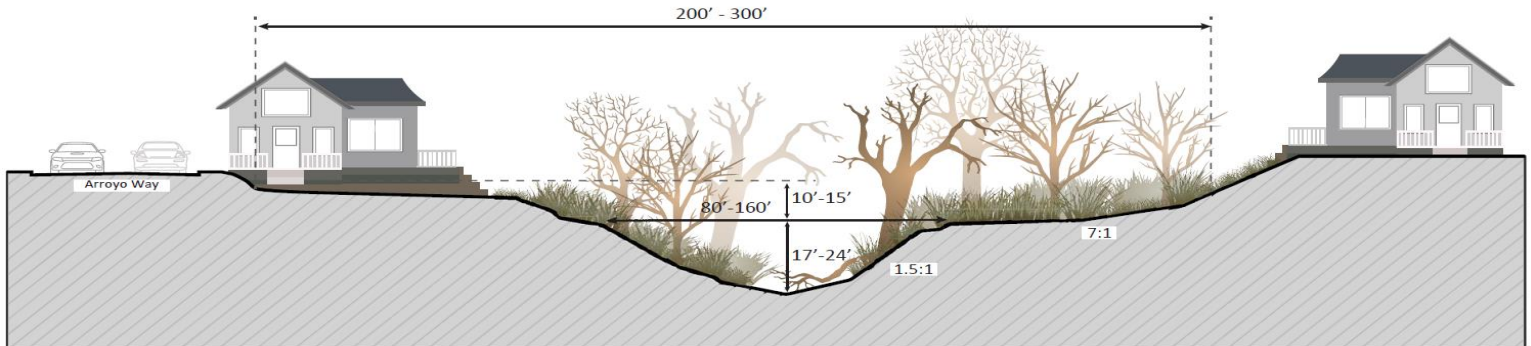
Typical Reach 7 cross-section (north half), looking downstream
